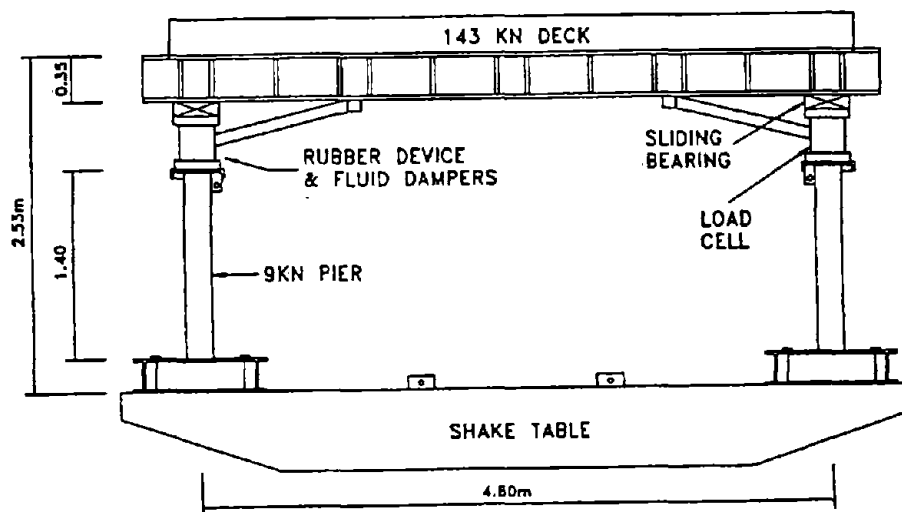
Tested bridge structure with fluid dampers (after Constantinou et al., 1992b).
